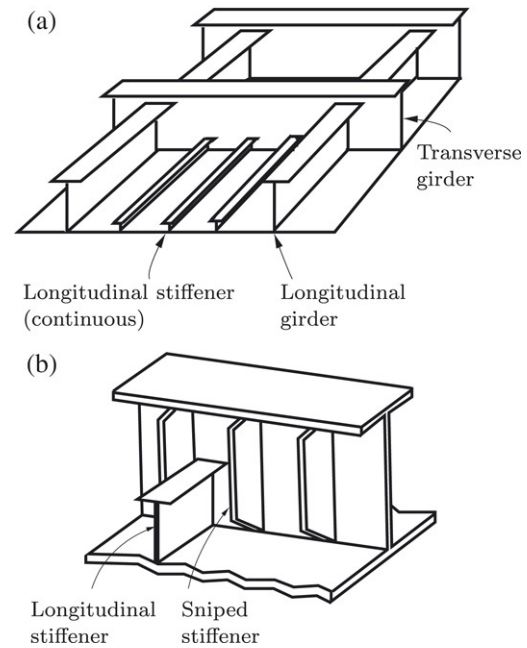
Examples of stiffened plates: (a) Stiffened plate enclosed by longitudinal and transverse girders, and (b) girder stiffened by sniped stiffeners.
